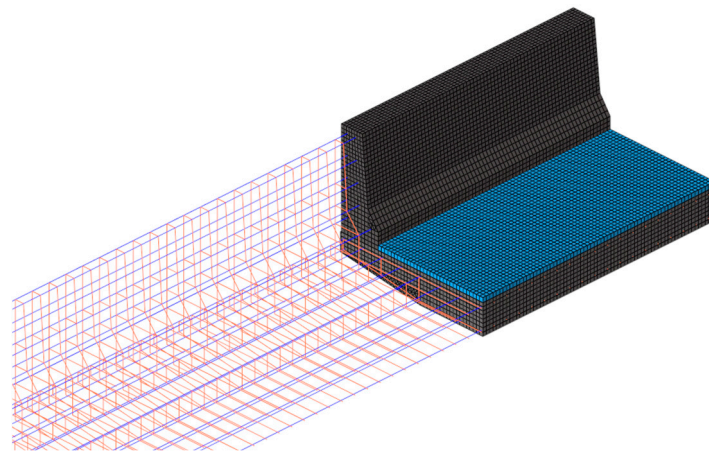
Mesh design for concrete barriers consisting of concrete and reinforcement bars.
